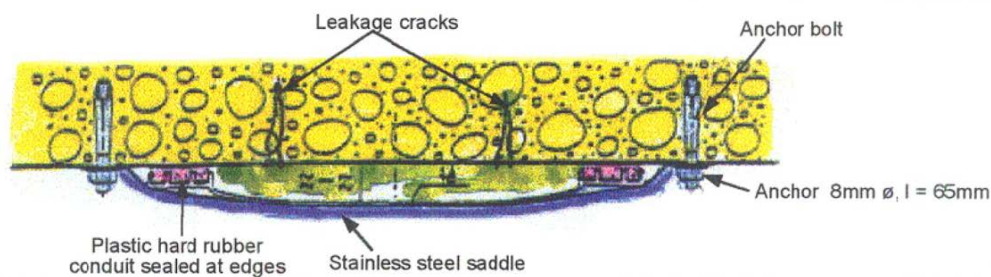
Stainless steel saddle anchored to concrete for conveying water through leakage cracks (Russell, 2001).
